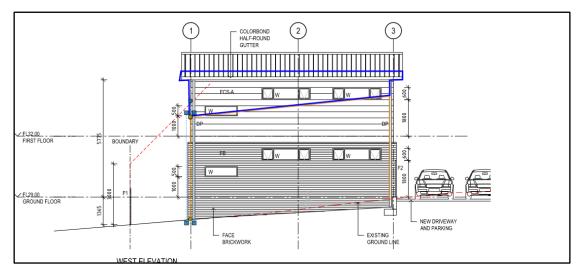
Graphic identifying the protrusion from building envelope facing 30 Montrose Road, as advertised.
